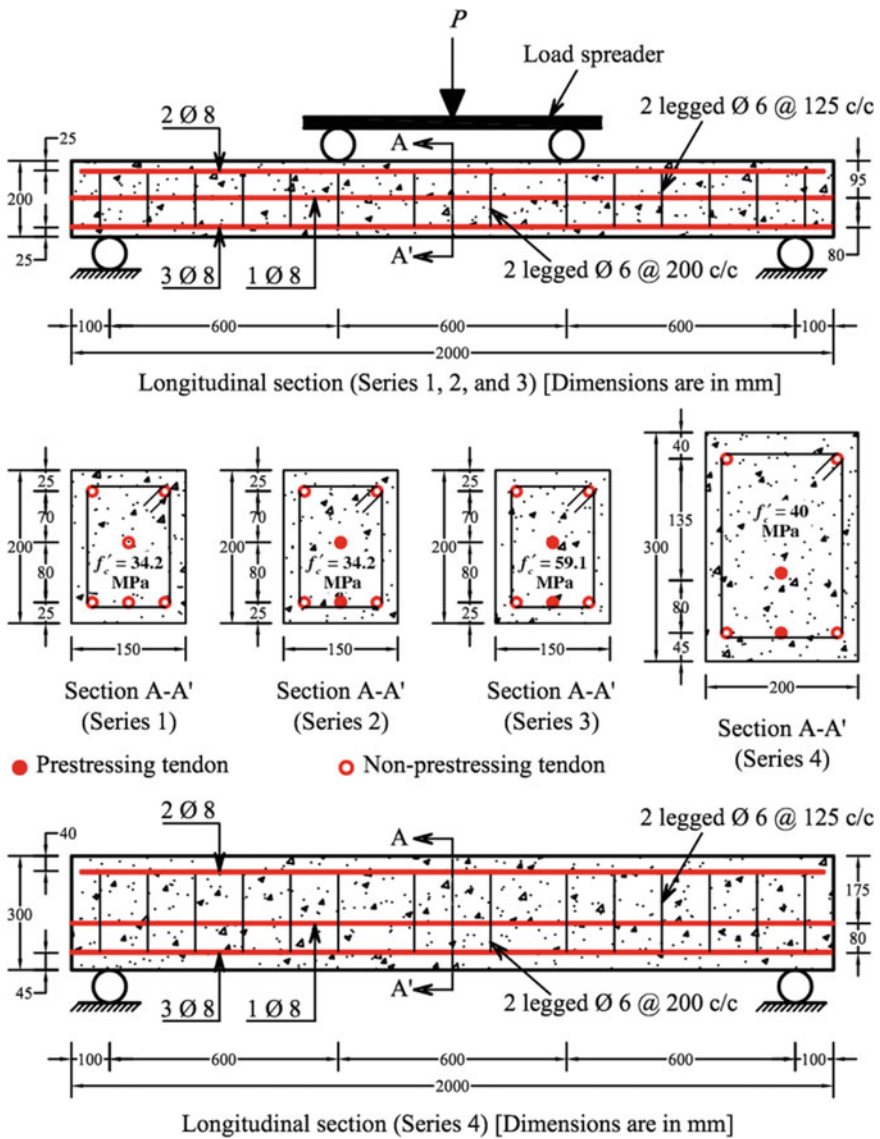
Geometric and reinforcement details of the beams studied [4]
